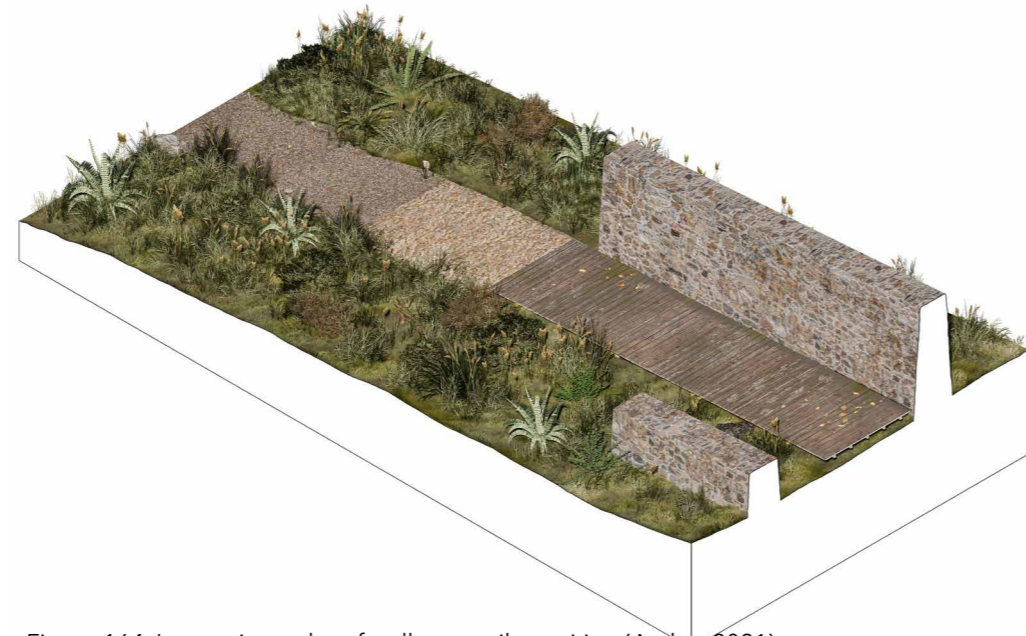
Isometric render of walkway-trail transition (Author,2021).
